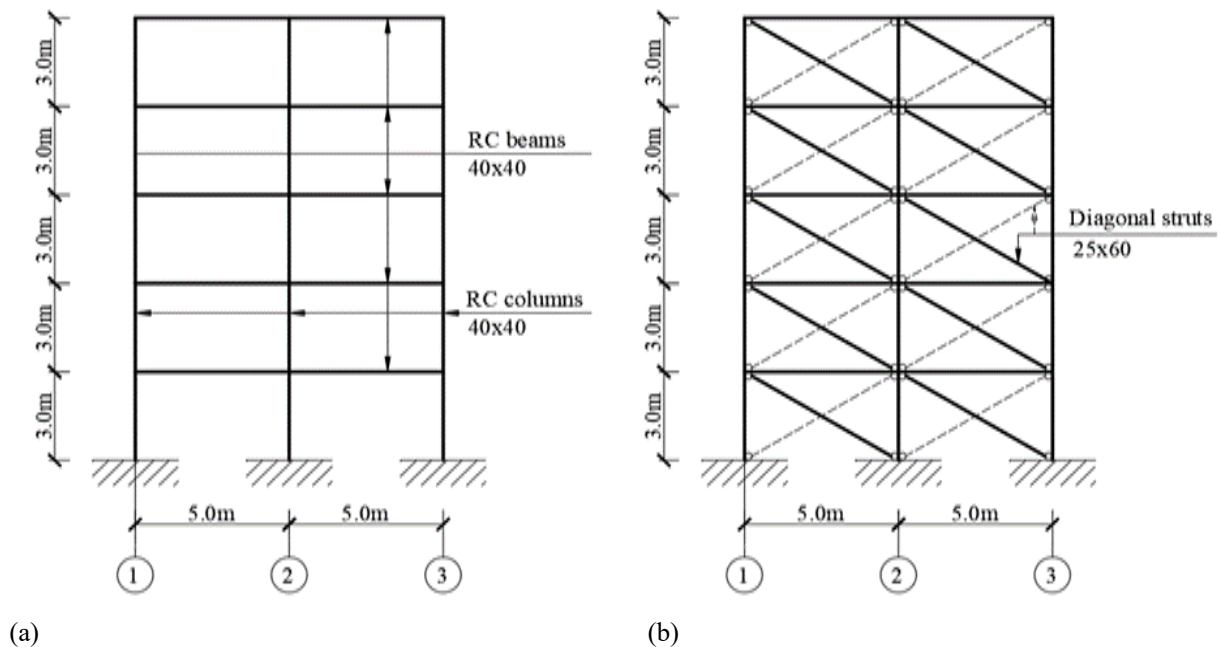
Elevation view of RC frame: benchmark (a), with infill panels (b)
